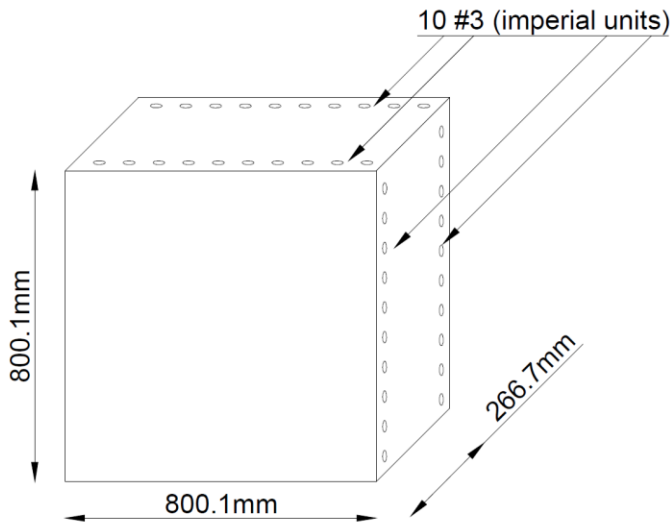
Sketch of the wall specimen with the non-prestressed reinforcement.
